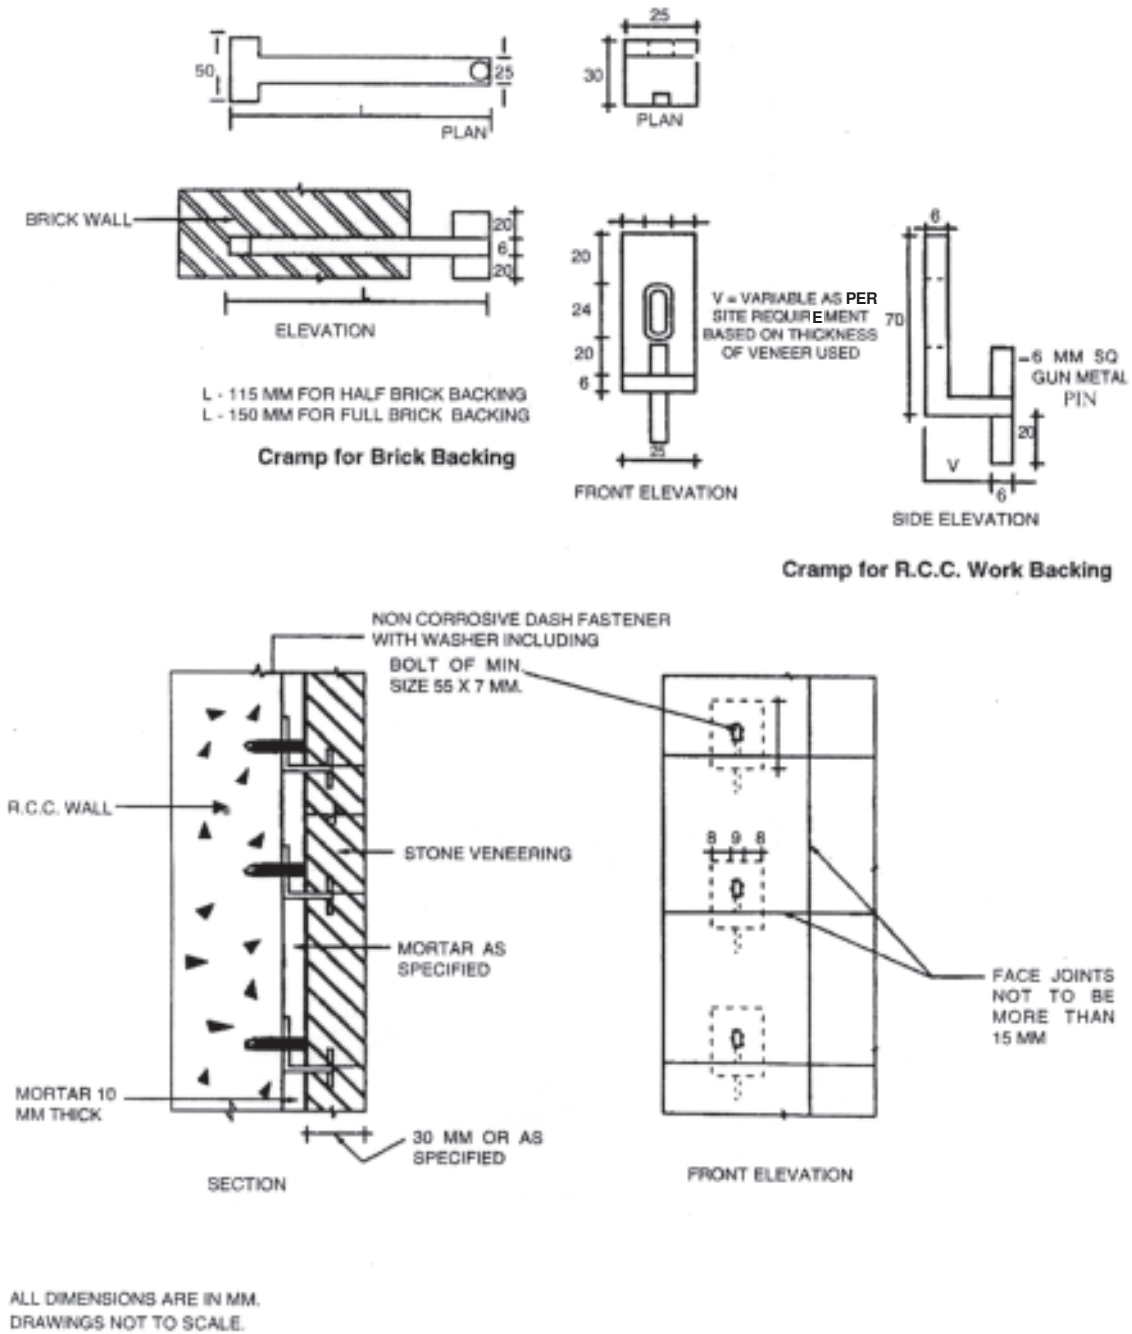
Stone Veneering - Typical Fixing Arrangement
